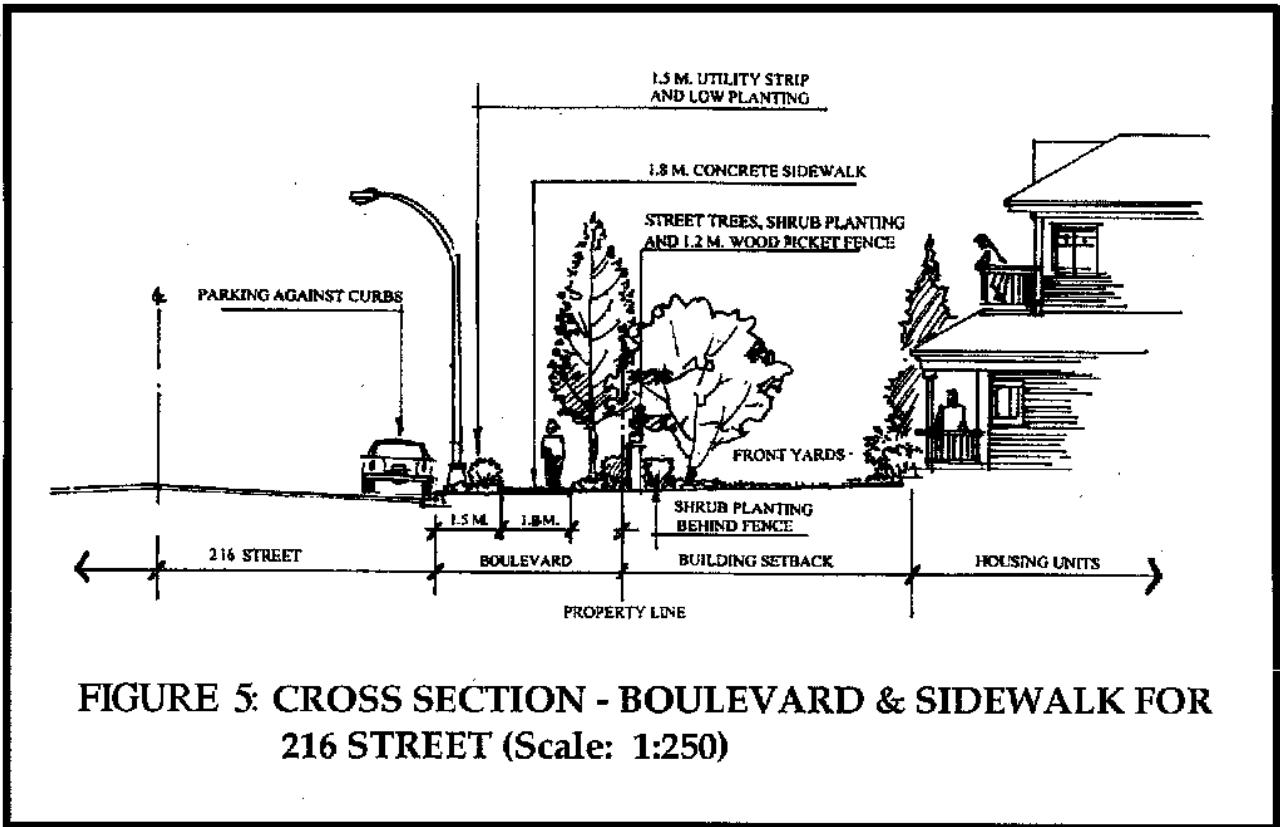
CROSS SECTION - BOULEVARD & SIDEWALK FOR 216 STREET (Scale: 1:250)
